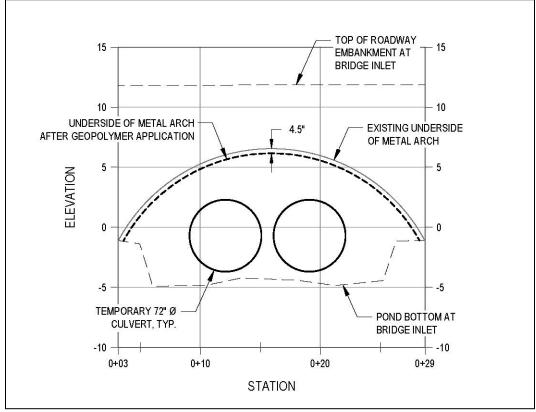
Water Diversion Alternative 2.2 Bridge Inlet Cross-Section
